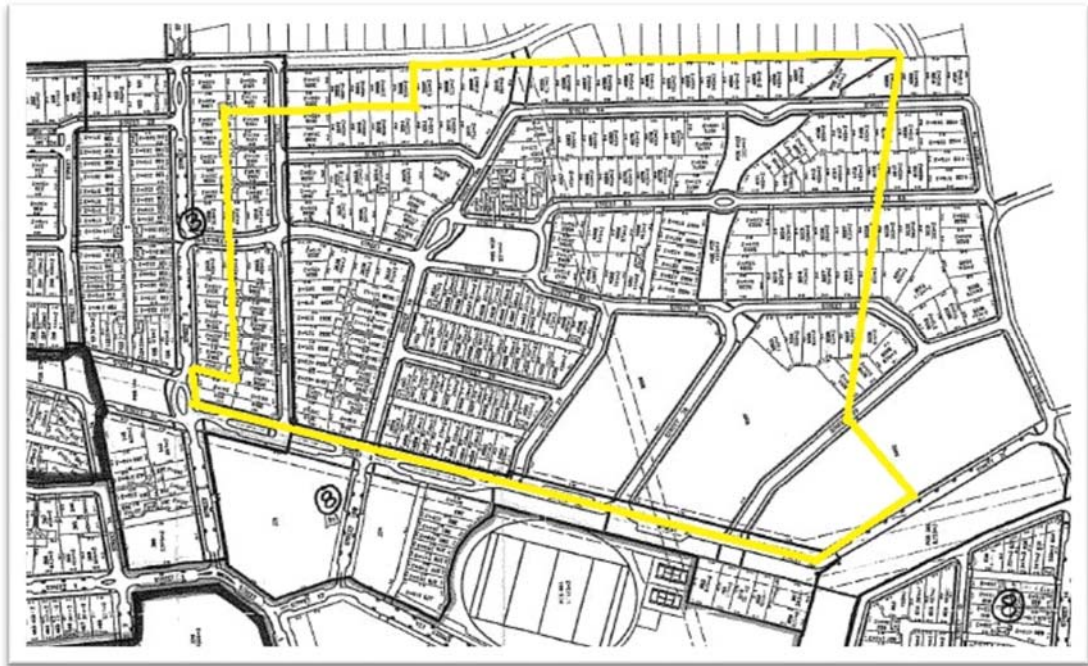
Approved Development Consent No. 741/2002 Subdivision Plan area affected by DA647/2015
